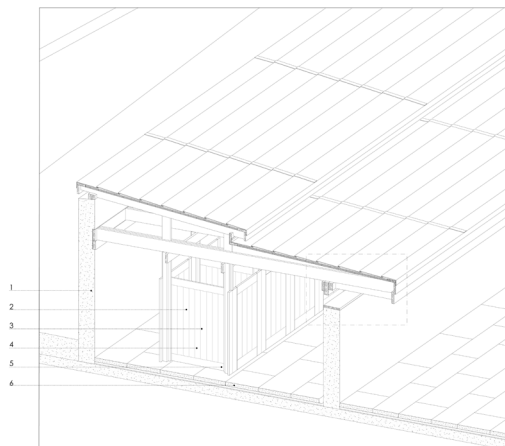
Didactic model of a section of the Ocean Swimming Pool. The authors. 1– Lightly reinforced concrete walls; 2 – Partition walls of dark Baltic pine treated with linseed oil and fixed with galvanized fittings; 3 – Roof's structure made out of dark baltic pine treated with linseed oil and fixed in place with galvanized fittings; 4 – Cover in copper over the insulation made out of a bituminous membrane and agglomerated cork of 1mm thick; 5 – Wooden structure ceiling made of 4cm thick wood slats; 6 – Precast reinforced white concrete slabs.
